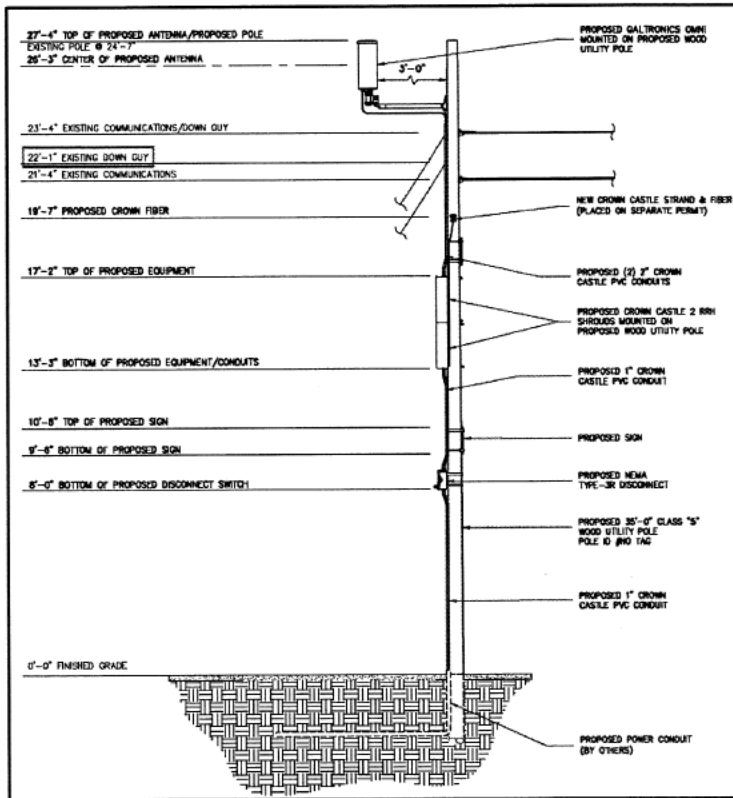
Incorrect down Guy locations (Source: Plans A-3 Panels 1 and 2, annotated by Dr. J. Kramer).
